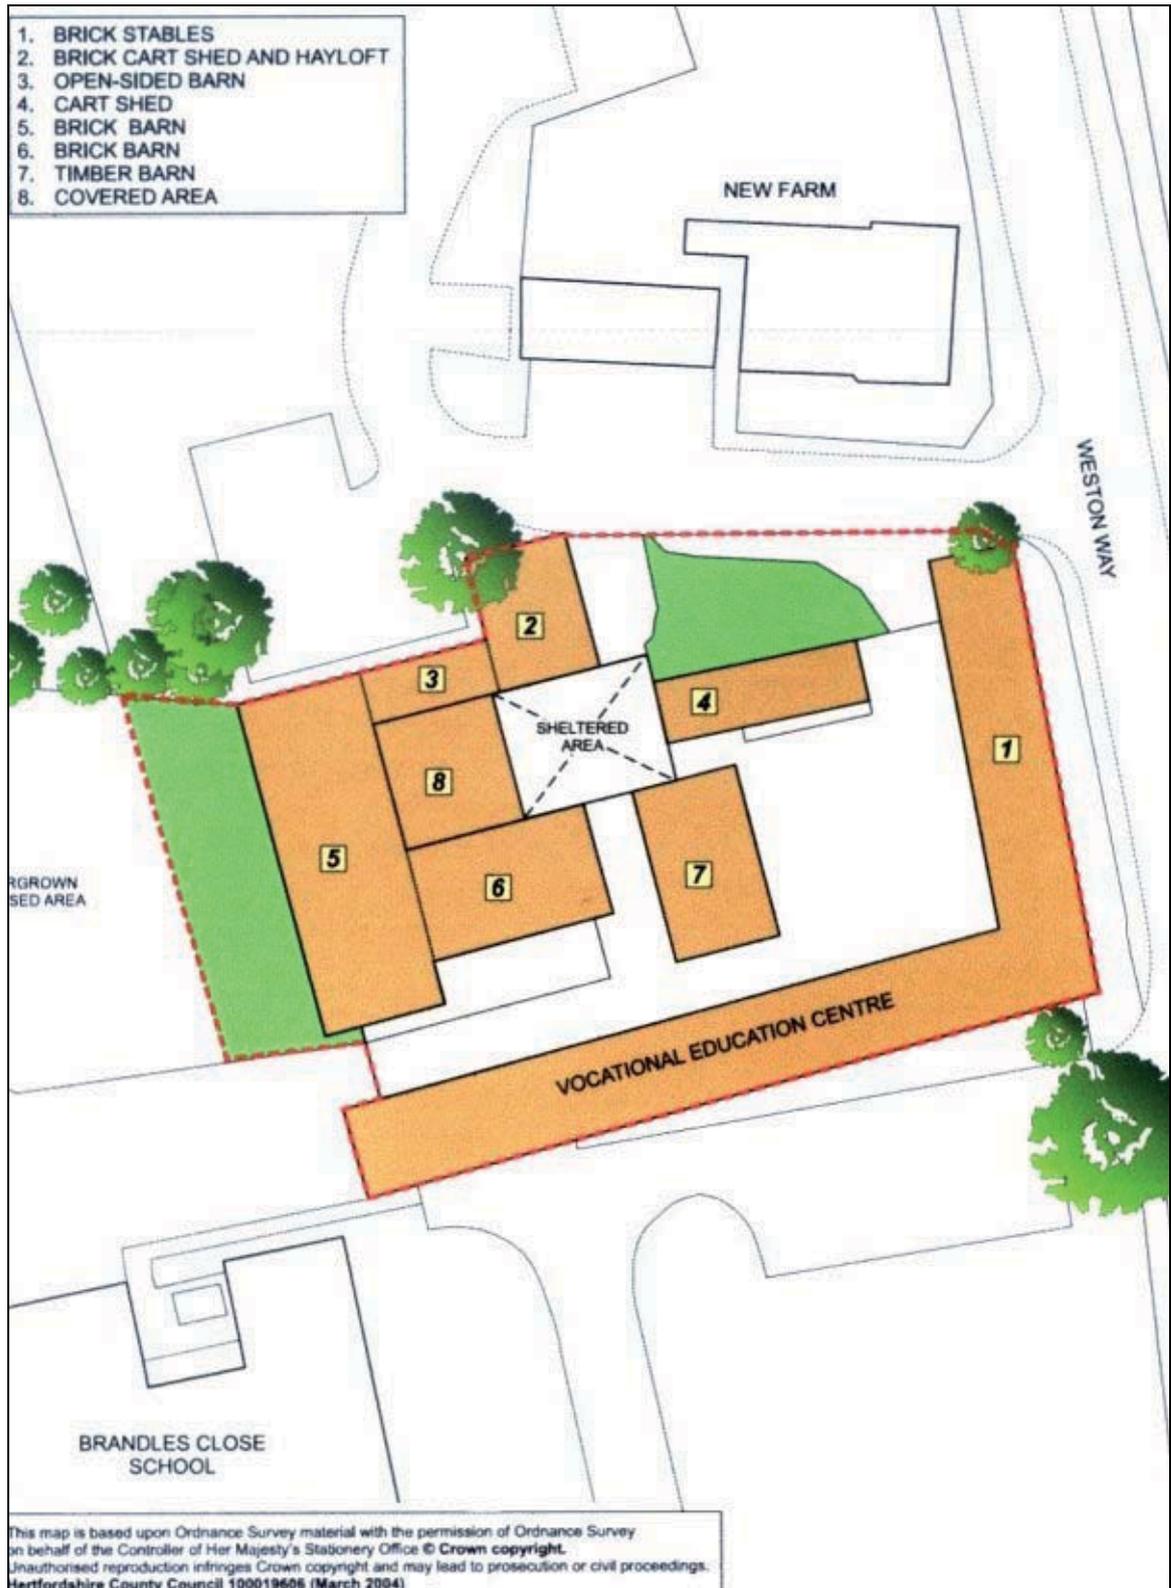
Site plan of current buildings supplied by Vincent and Gorbing Planning and Design (scale 1:1250).
